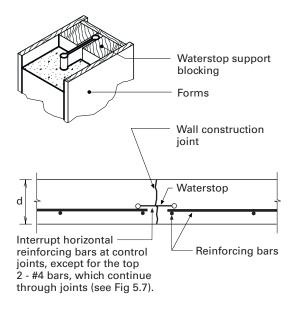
Wall construction joint with waterstop at midpoint of wall (wet joint).
